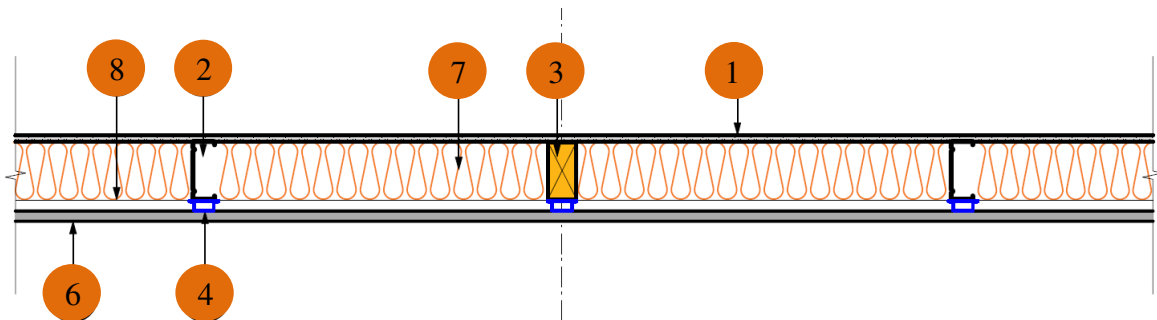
Horizontal UBIQ INEX>EXPRESS Wall System Steel or timber Frame – Plan Section
